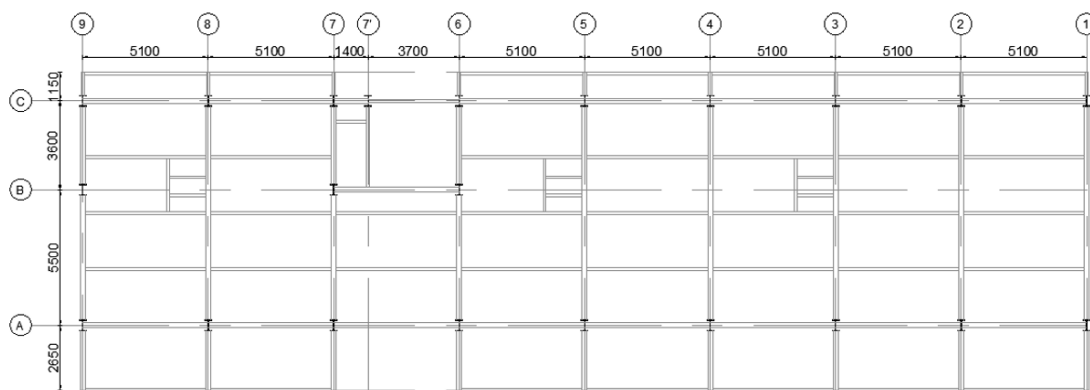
Floor plan view with the direction of the columns and dimensions of the openings.
